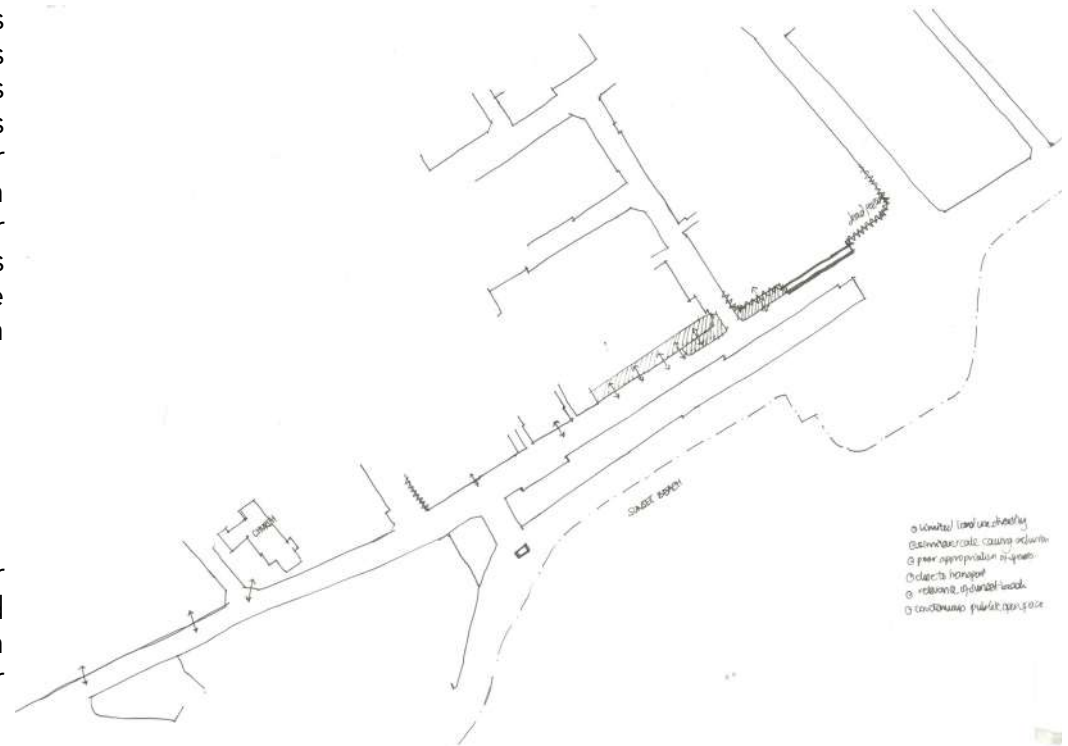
302 Beach Road Parking, Cape Town, South Africa.
